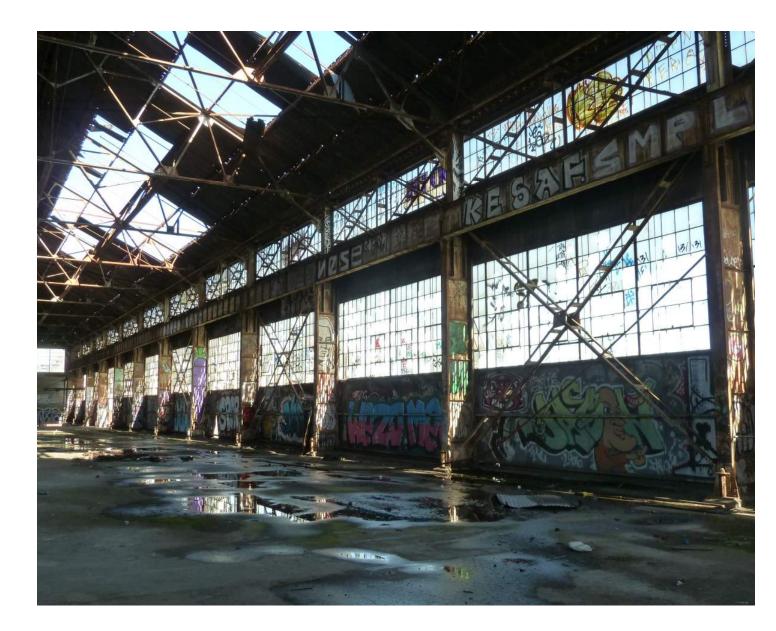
"X"-Brace at Every Other Bay at East Face
